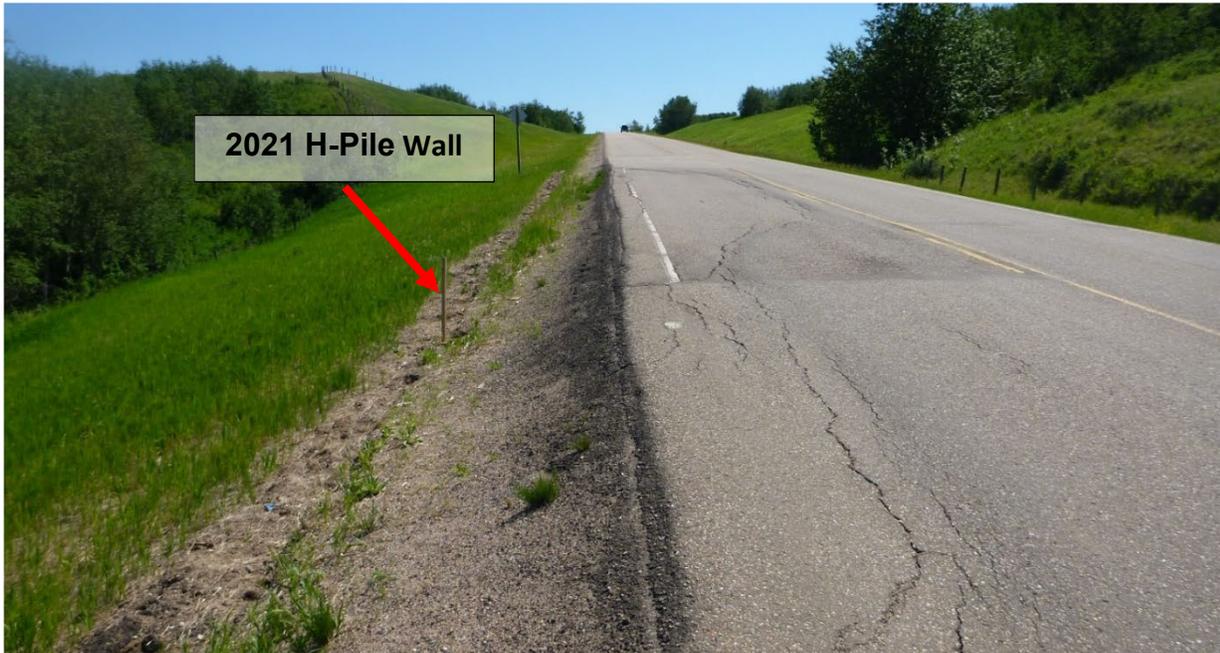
Asphalt patch in the westbound lane and 2021 H-Pile Wall location. Disturbed ground is location of pile wall (red arrow). Photo taken June 29, 2021 facing west.
